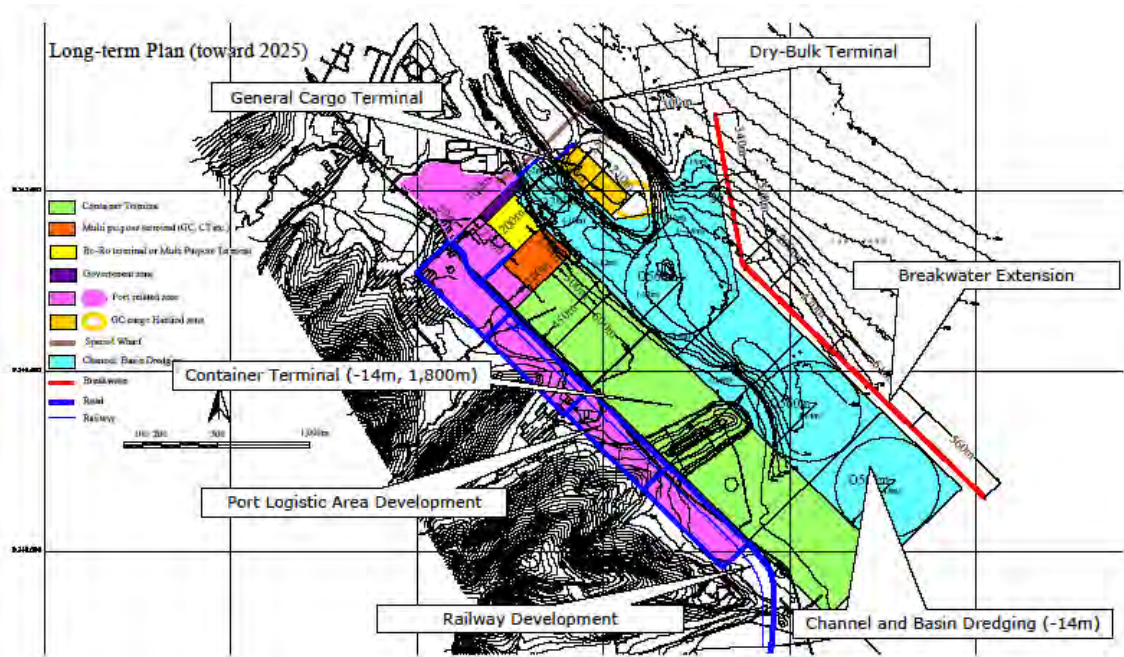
Long-term Plan of Bojonegara Port toward 2025
